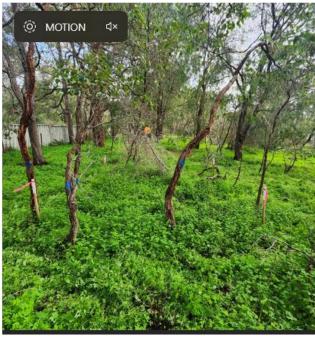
Blue taped tree stump to be cleared for new access road. Larger vegetation avoided for clearing area.
